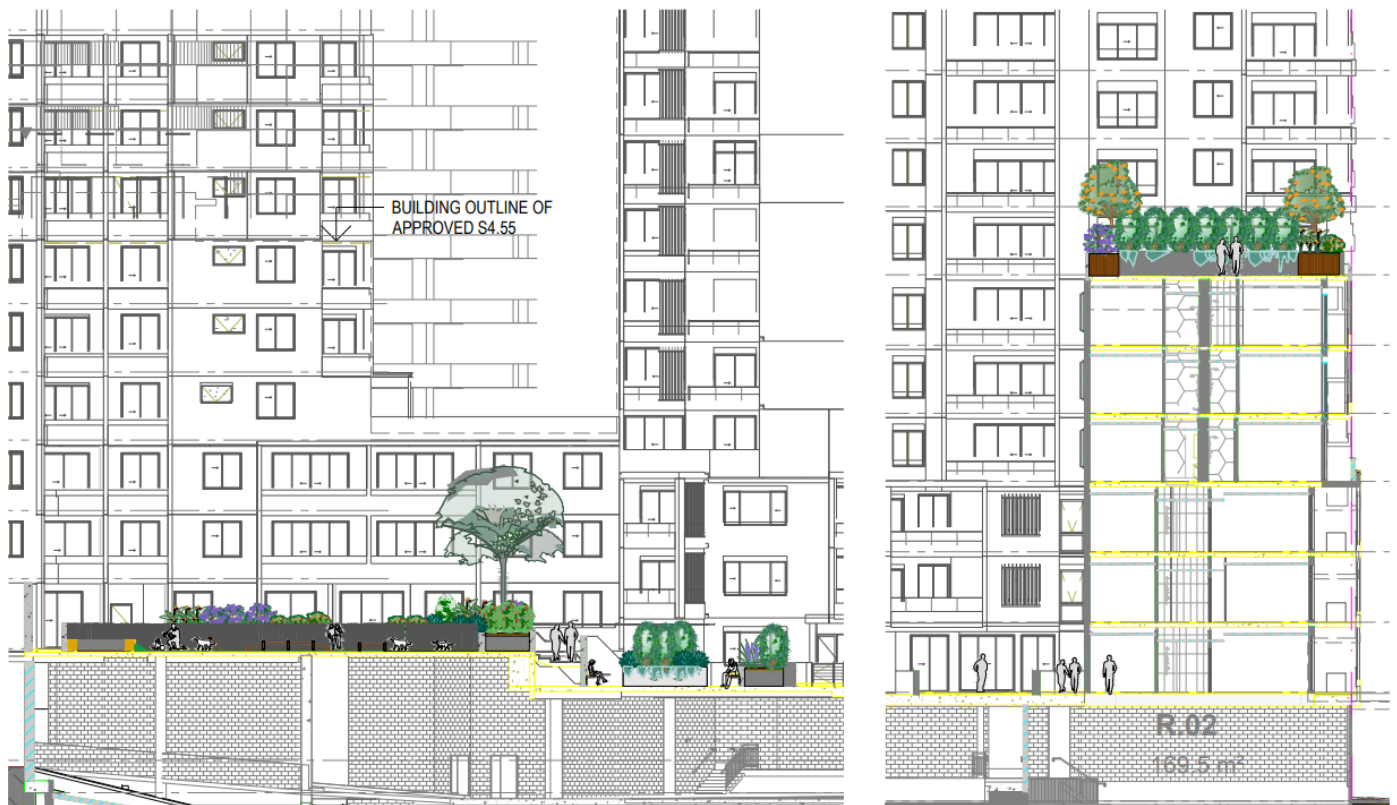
Communal open space on Level 1 and Level 7 shown in elevation view (Source: Concept Landscape Architects, 2025)
